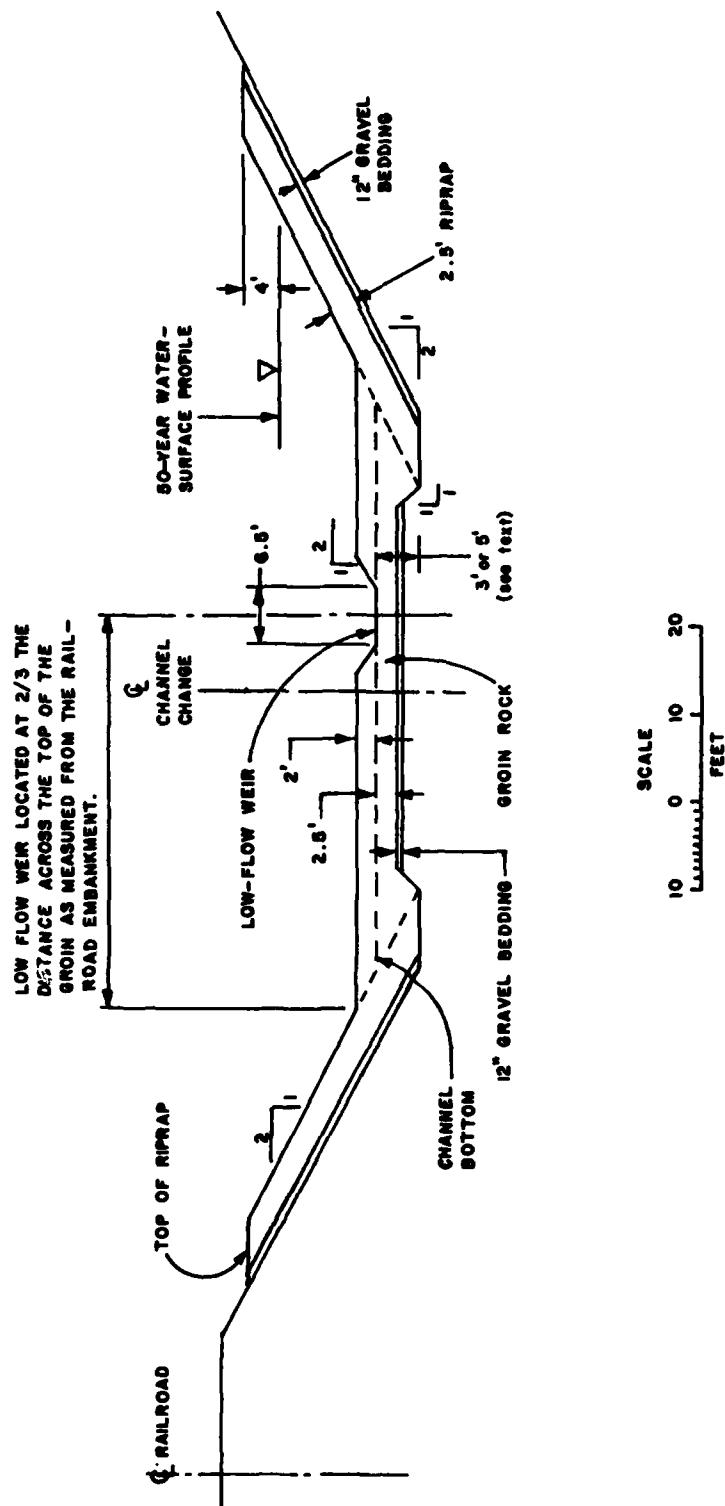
Typical cross-channel view of groin and railroad embankment (adapted from Great Northern Line Change, Ariana Creek to Jennings, Groins, Drawing E-53-33-81, December 1965, NPS)
